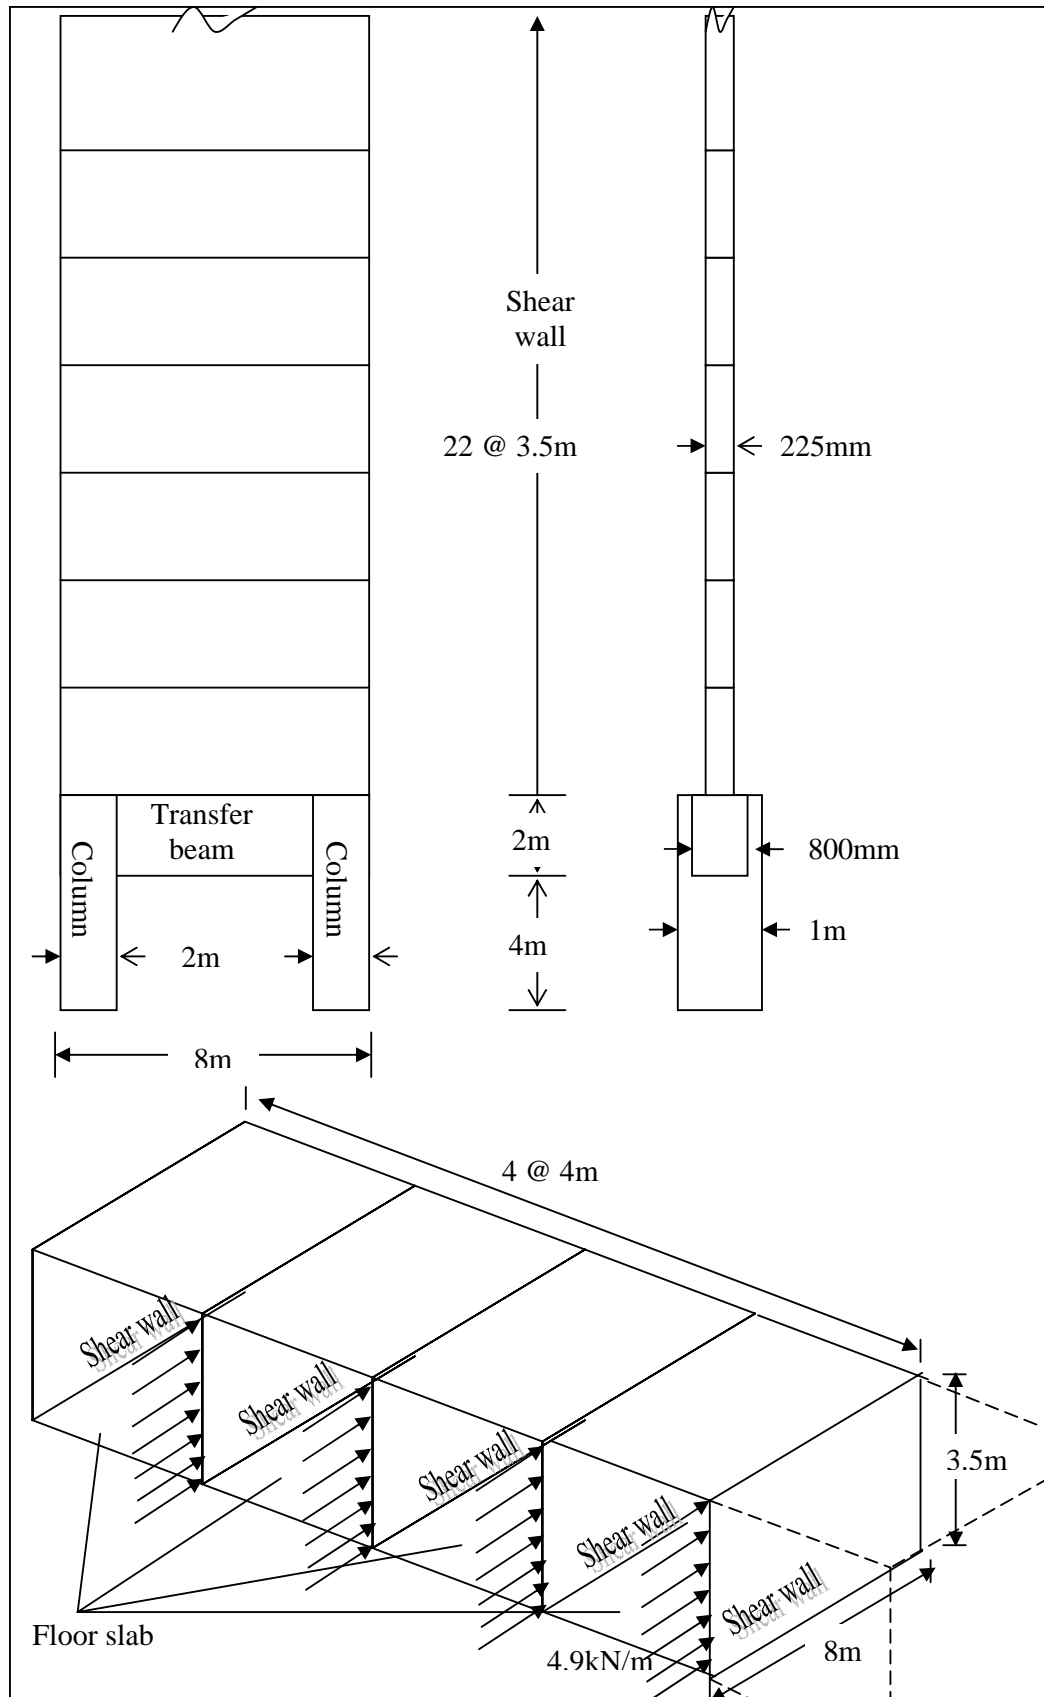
The views of the shear wall-transfer beam structure with dimension.
